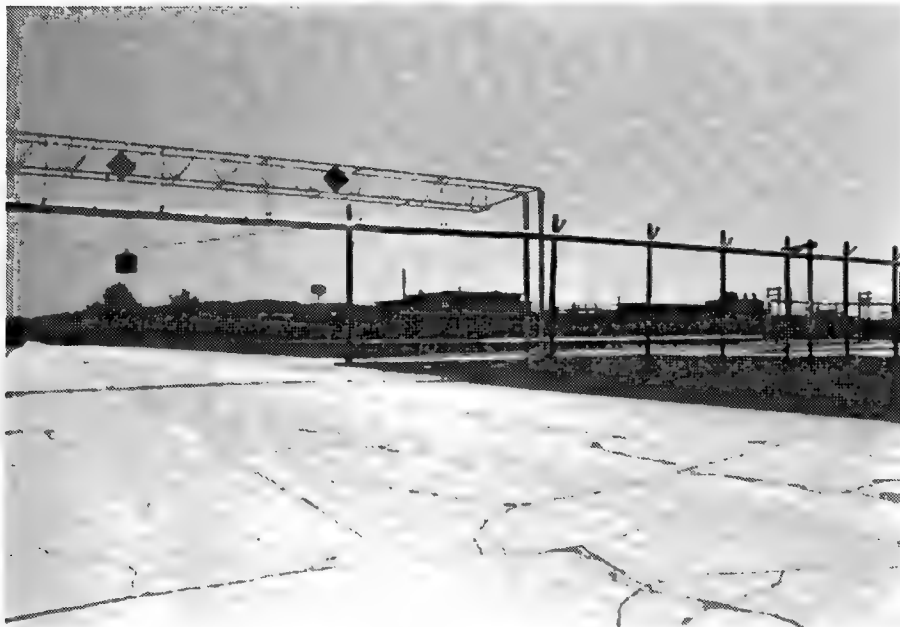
Overhead Pipes. Building 8, a Ballistic Testing and Ammunition Quality Control Building, is in the background.
